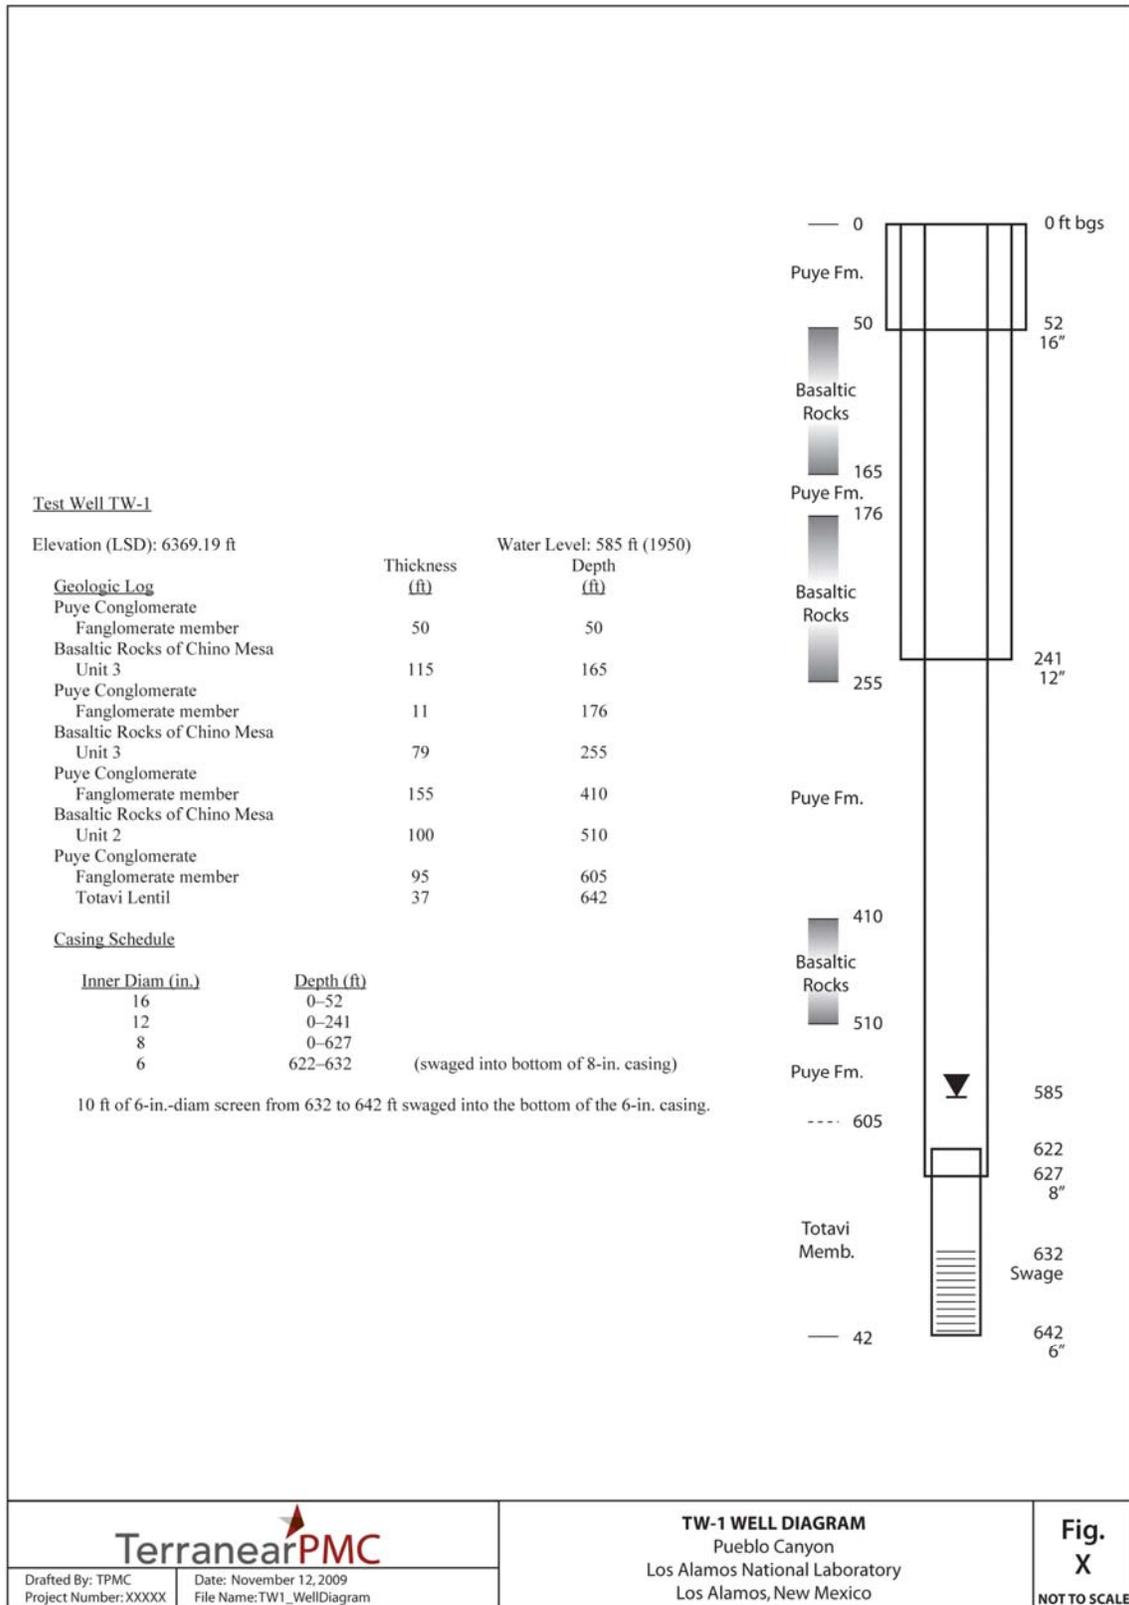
Monitoring well TW-1 as-built well construction diagram
